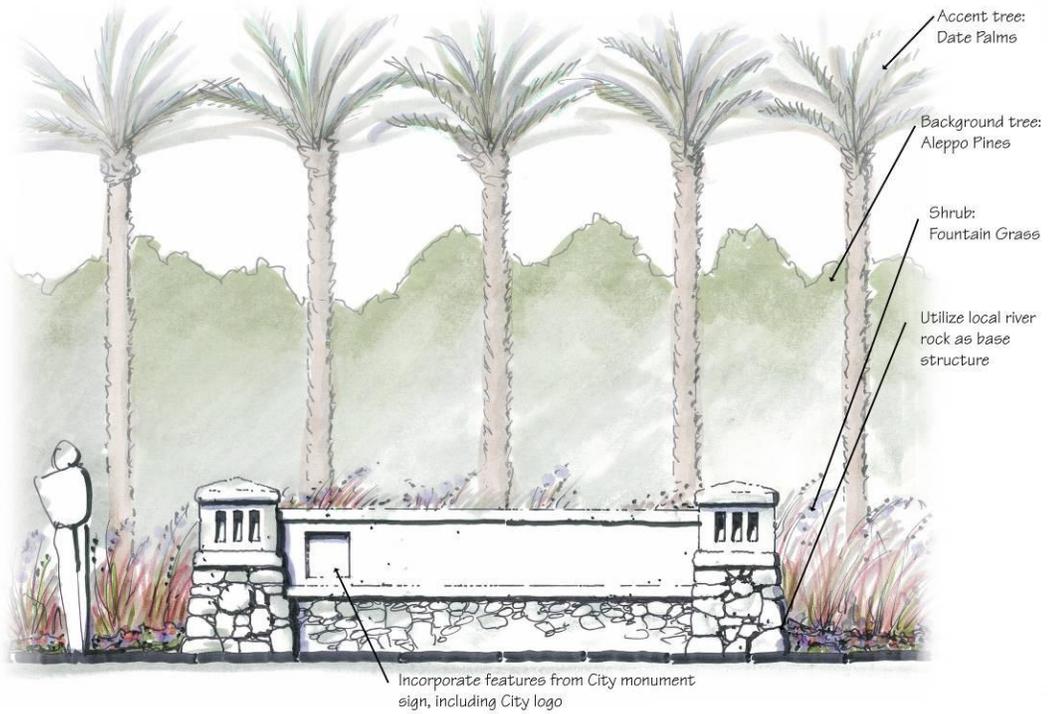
Secondary Gateway Intersection Enhancement Concept
